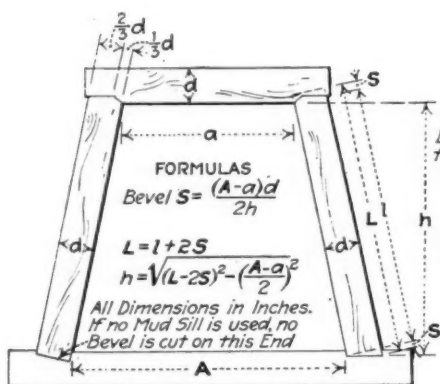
DETAIL OF A FRAMED TIMBER SET
